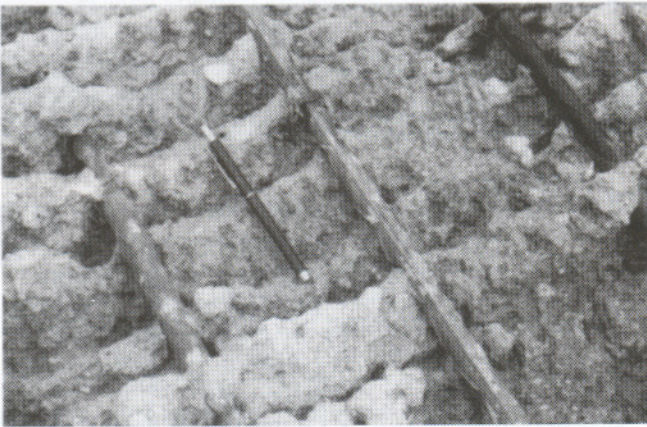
Existing reinforcement exposed by hydrodemolition.
